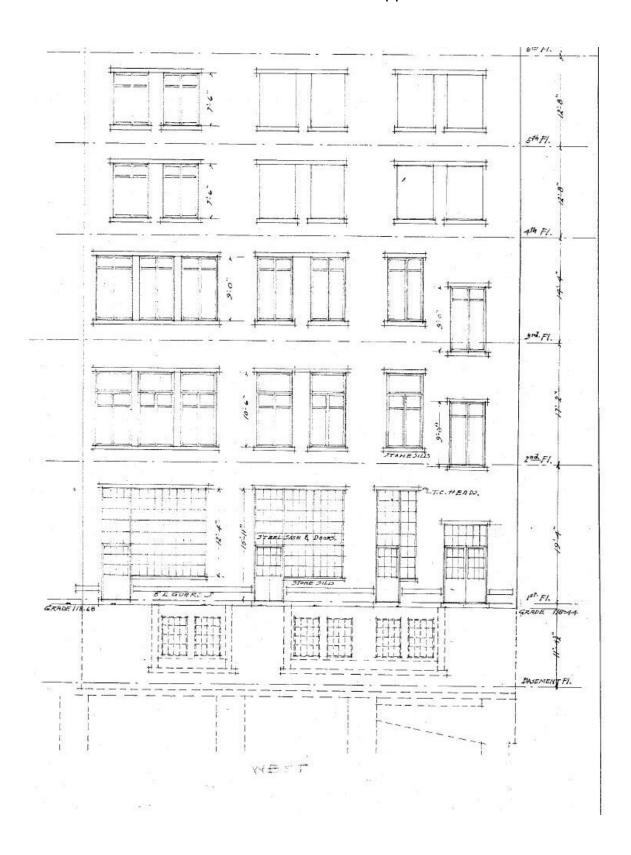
Book Building, Historic Drawing, Alley Façade, 1916
